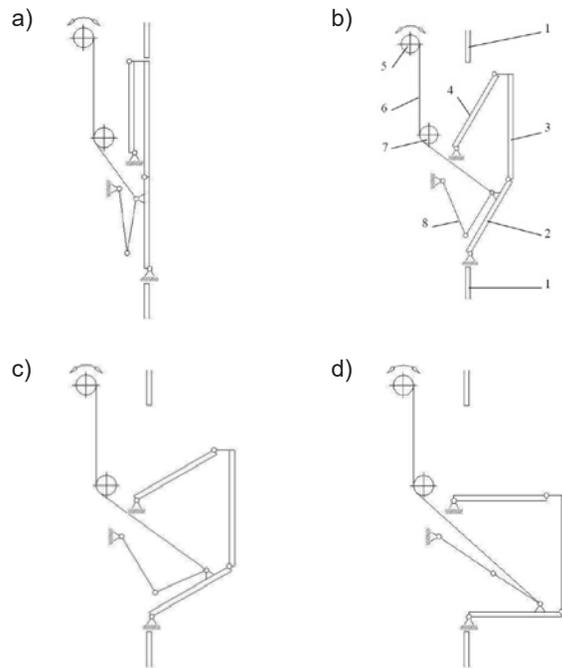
Kinematic diagram of the window-to-balcony module: a – closed position (window); b – tilted position 1 (30°); c – tilted position 2 (60°); d – open position (balcony); 1 – external wall of a building; 2 – balcony decking; 3 – balustrade; 4 – balustrade handrail; 5 – flexible cable drive system; 6 – flexible cable; 7 – passive roller; 8 – articulated rigid rod
